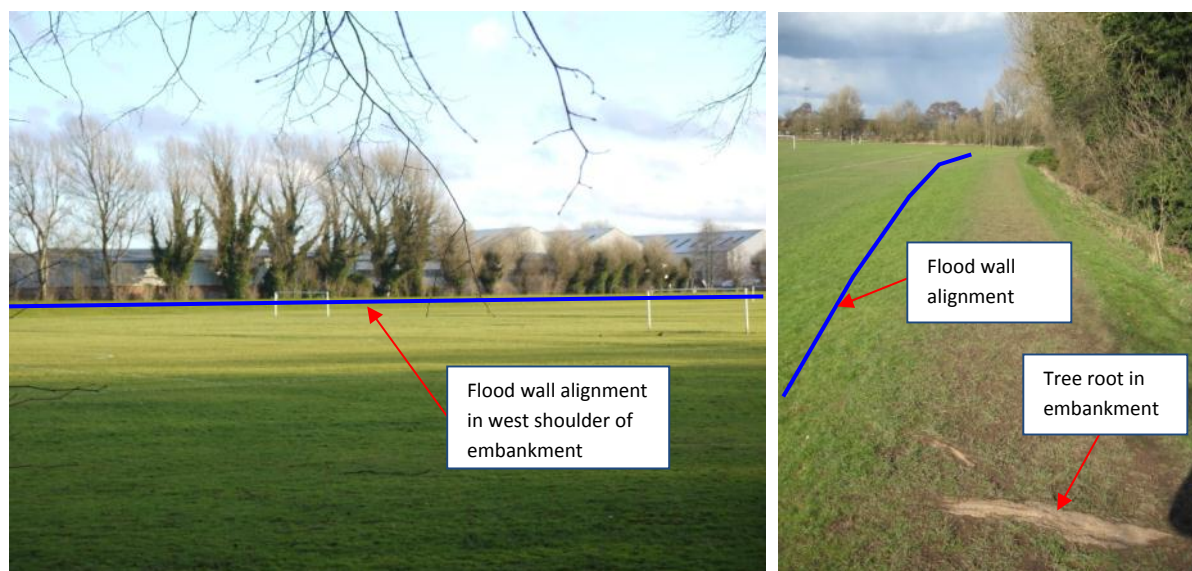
Proposed flood wall constructed in west shoulder of embankment
